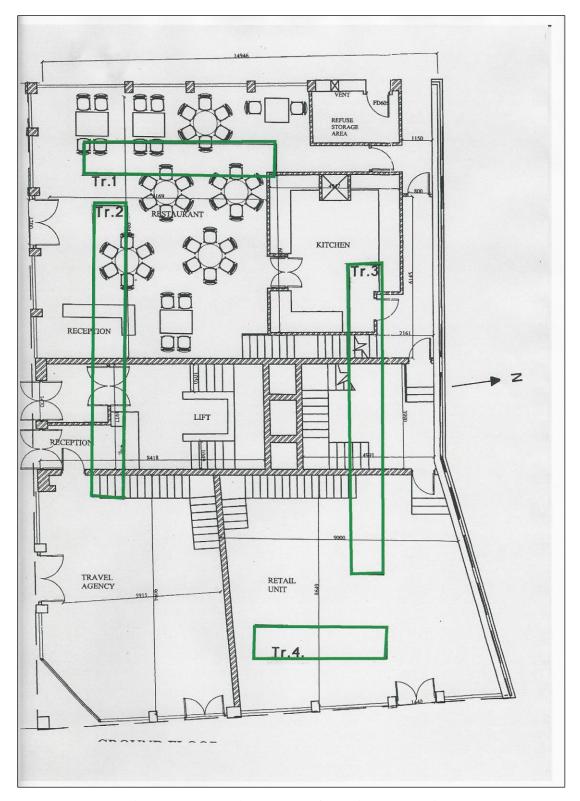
Trenching Layout from Archaeological Pre-Construction Testing at Potato Market, 2003.
